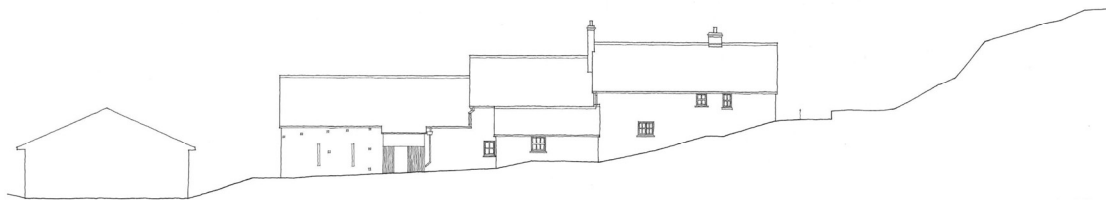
North elevation of Parc Lodge Farm 1:500
